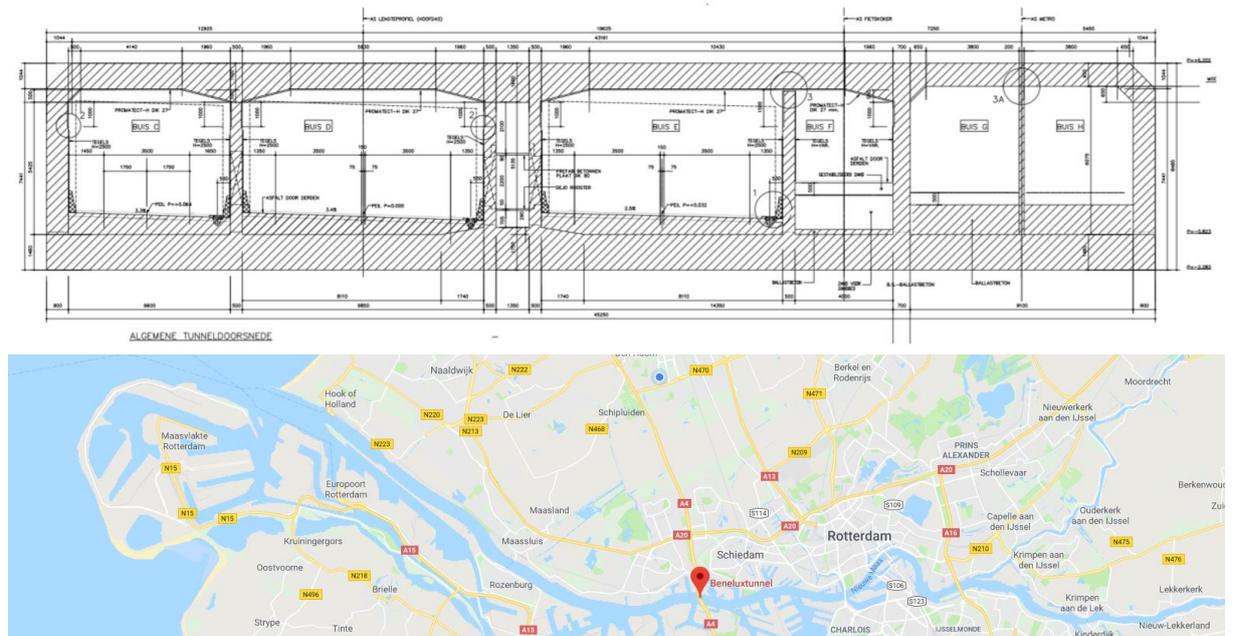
, BENELUXTUNNEL CROSS SECTION AND LOCATION
